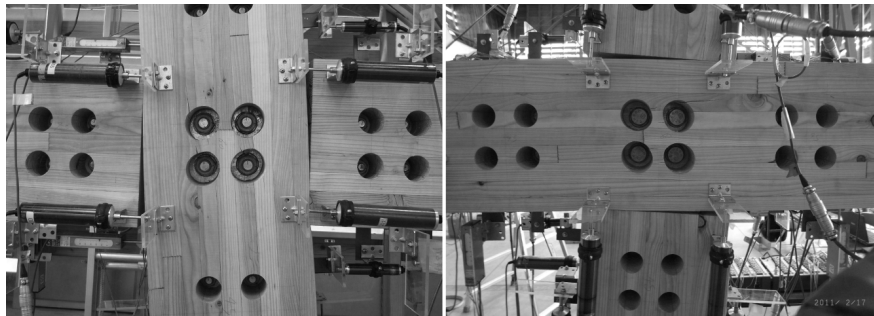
Shear cracks at pre-drilled hole periphery
